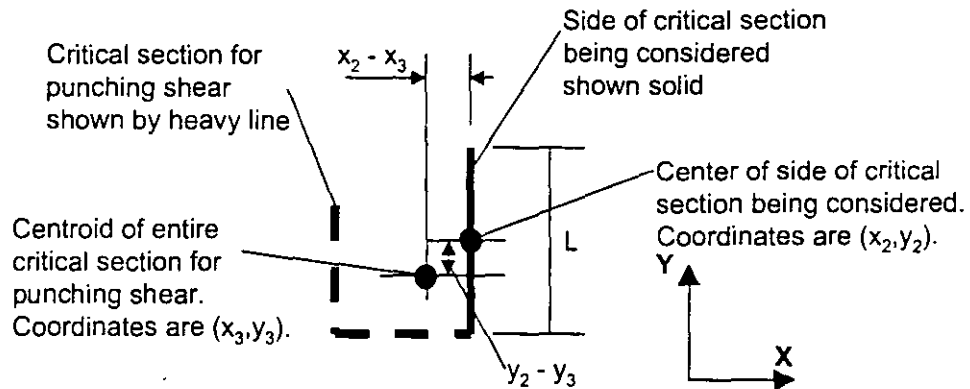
Plan View For Side of Critical Section Parallel to Y-Axis
